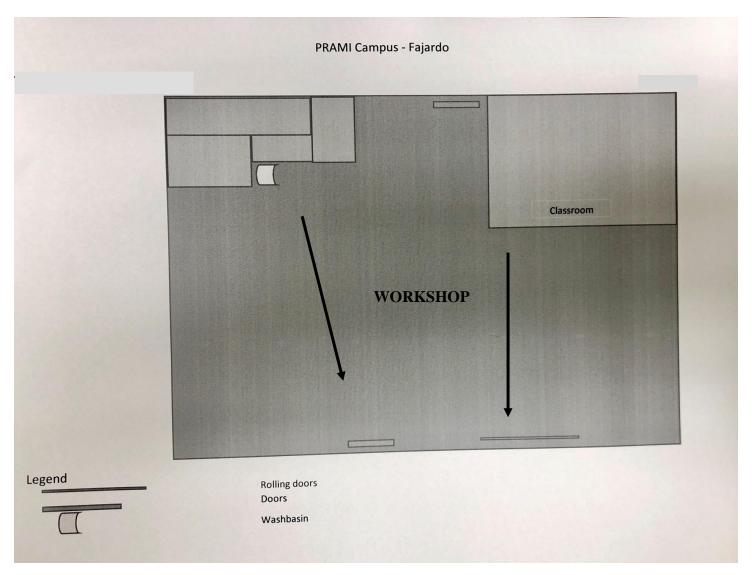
Emergency Exit Plan, Building C-2, First floor Airframe Classroom (welding) – C-103
